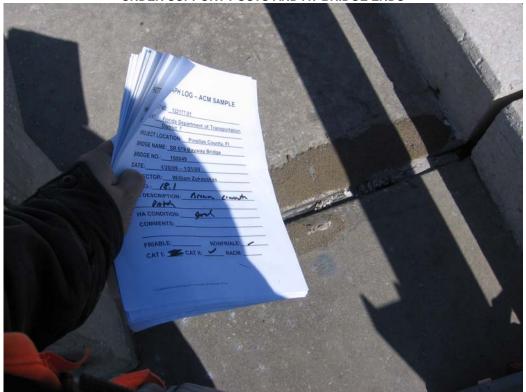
01/21/09 - SAMPLE 18.1 - HA 18 BROWN CONCRETE PATCH ON SIDEWALKS NW AND SE SIDES
